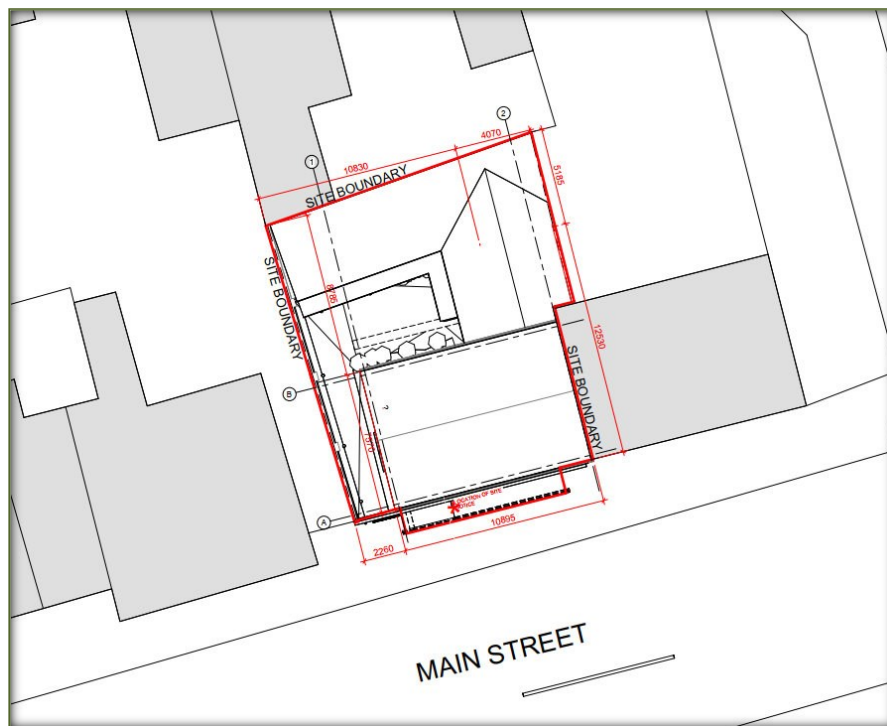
Site Plan (as prepared by Kavanagh Tuite Architects)
